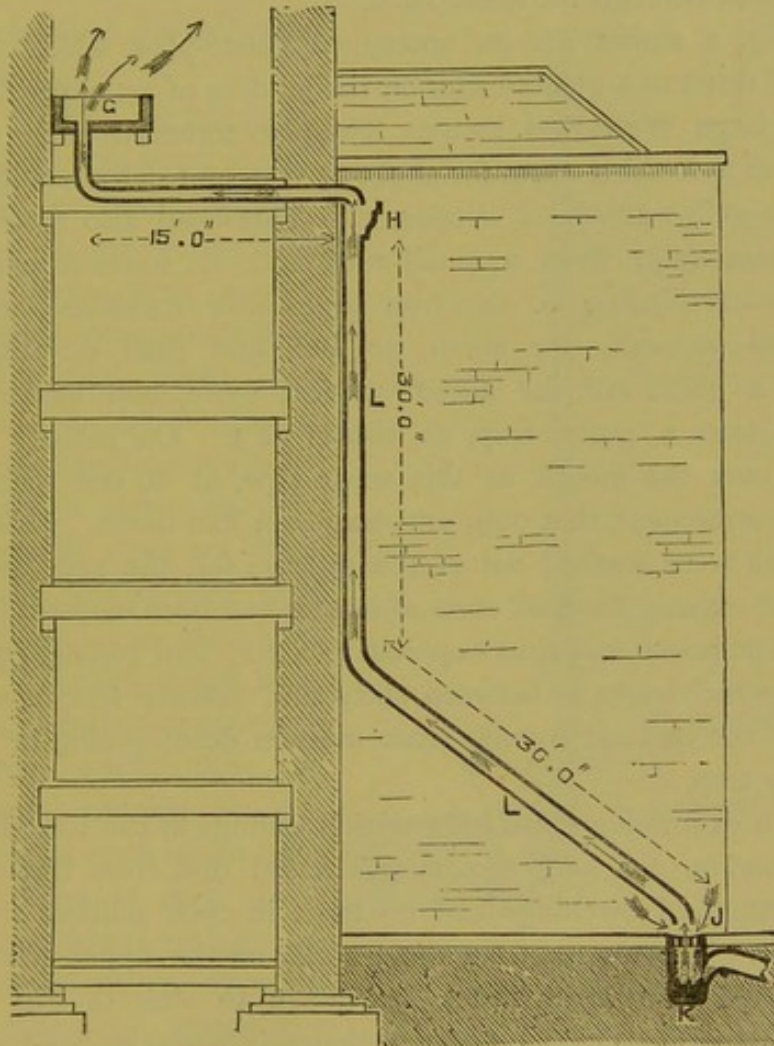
Untrapped Sink Waste;—a bad arrangement.
